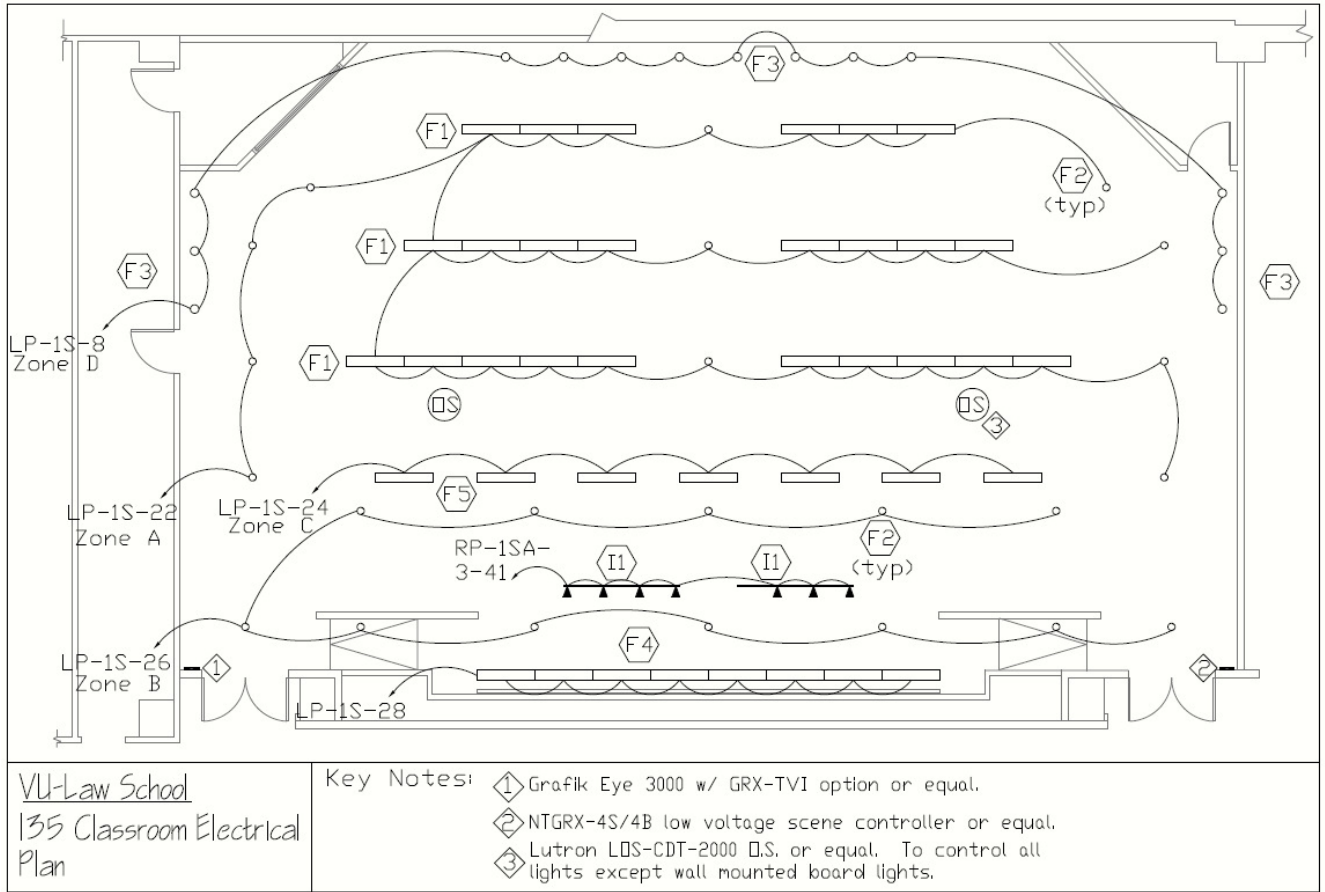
135-Seat Classroom Electrical Plan
